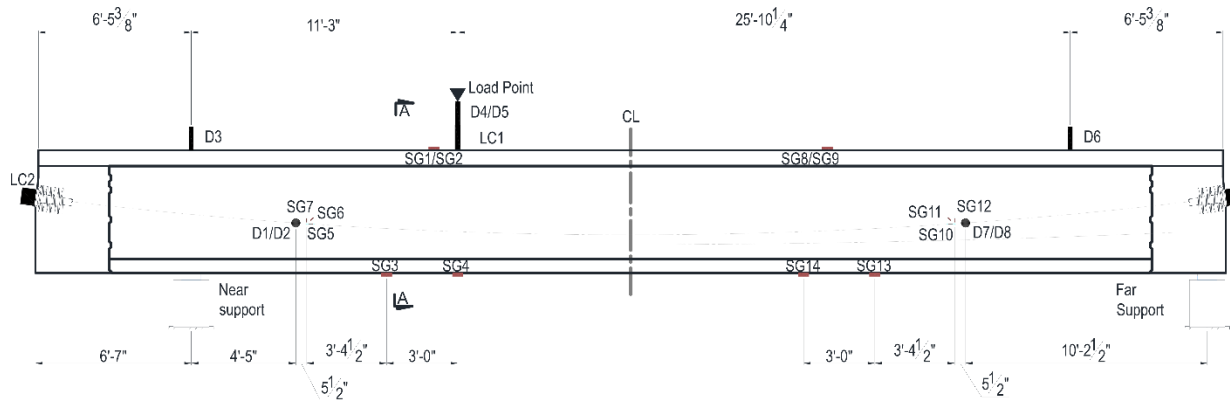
Typical instrumentation layout for phase 2 specimens
